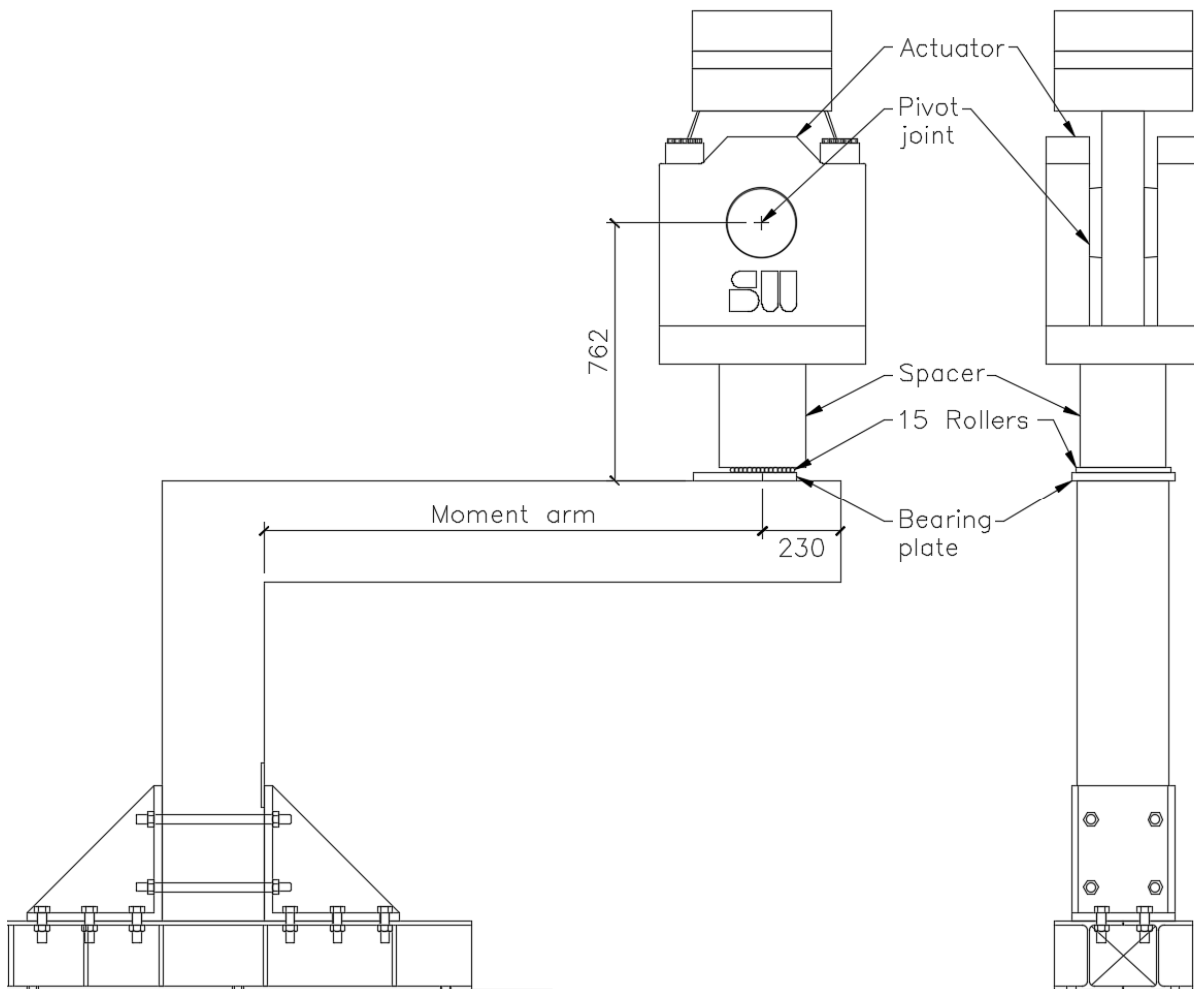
Loading Configuration for All Specimens, West Face (left) and North Face (right)
